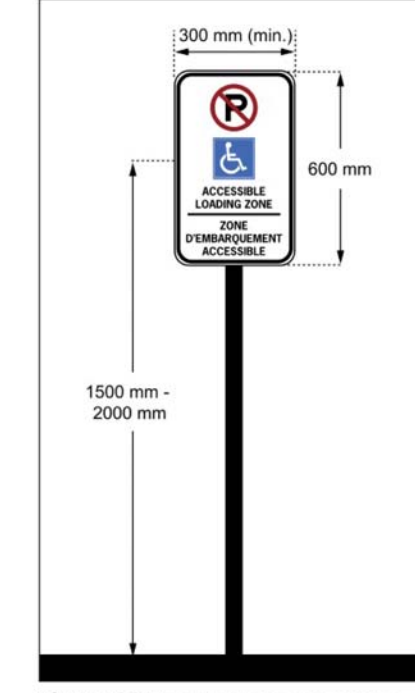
Accessible Passenger Loading Zone Vertical Signage
